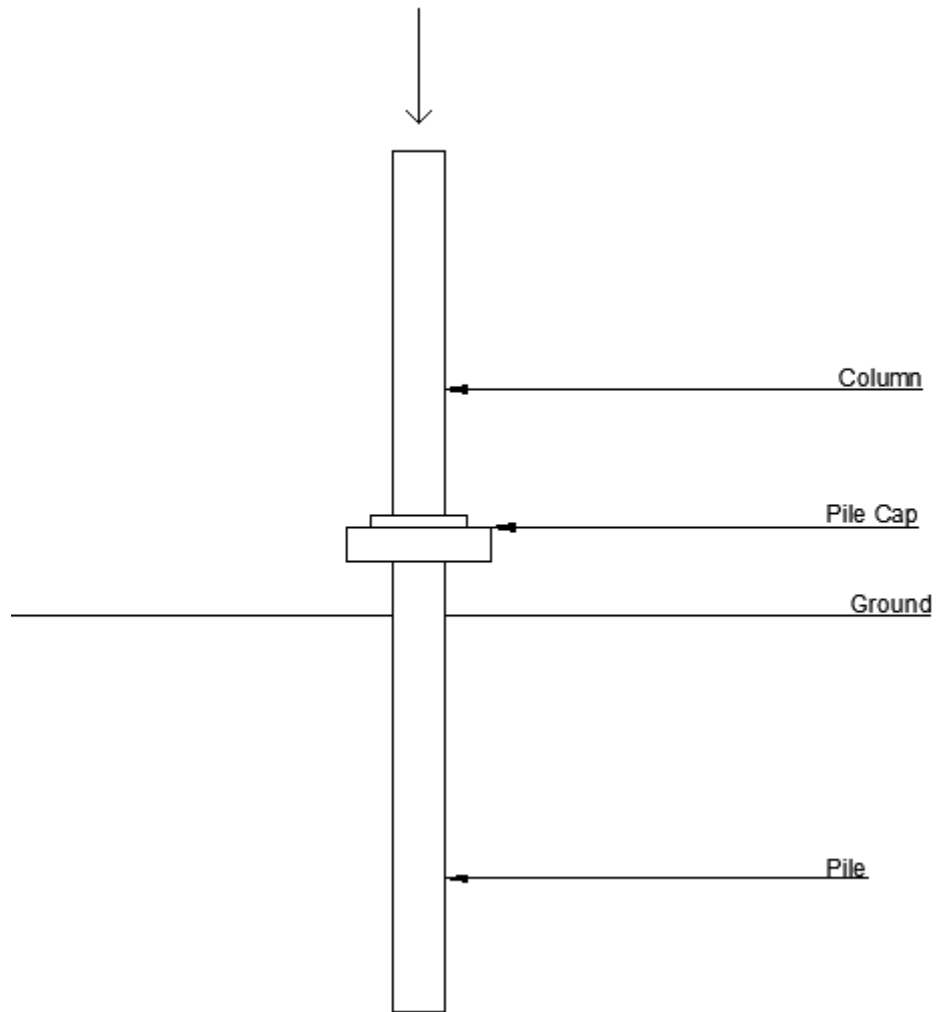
Pile Foundation and column for Hempcrete noise barrier wall
